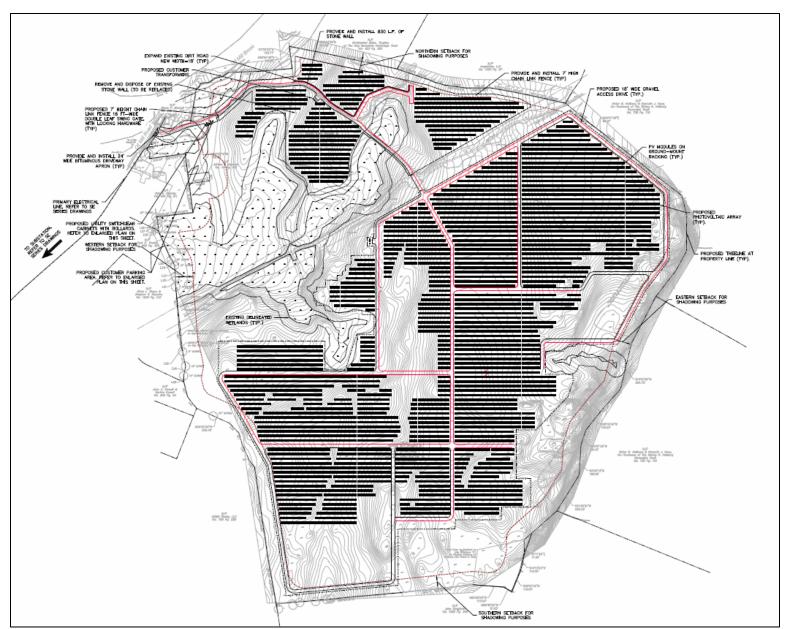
Plan view of the proposed project area in Waterford, Connecticut showing the locations of the proposed solar arrays, access roads and storm water management areas.
